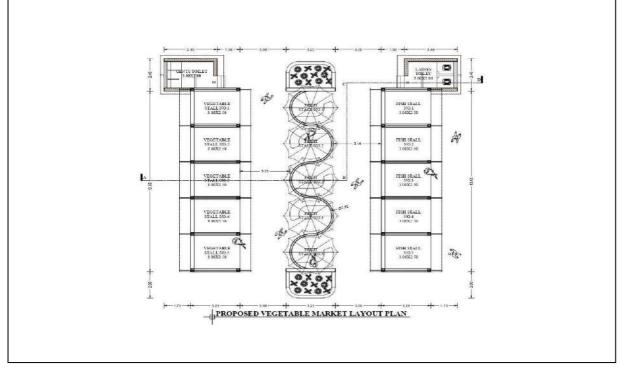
Ground Floor Plan of Vegetable Market
